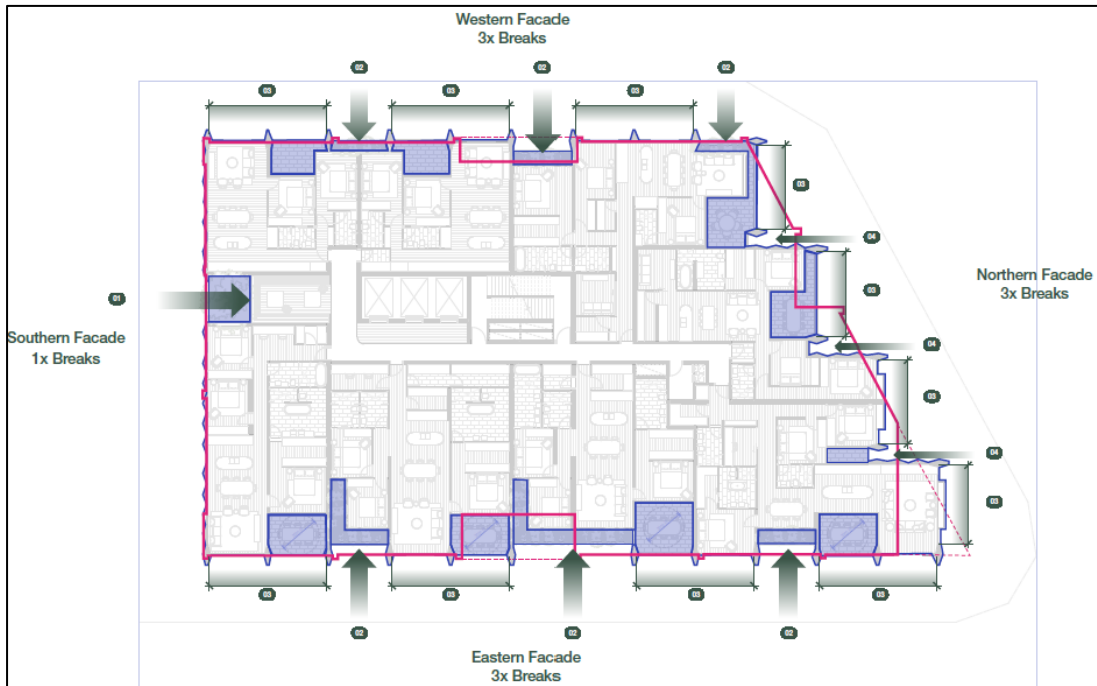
Revised Tower Floor Plate – Articulation and Break Strategy
